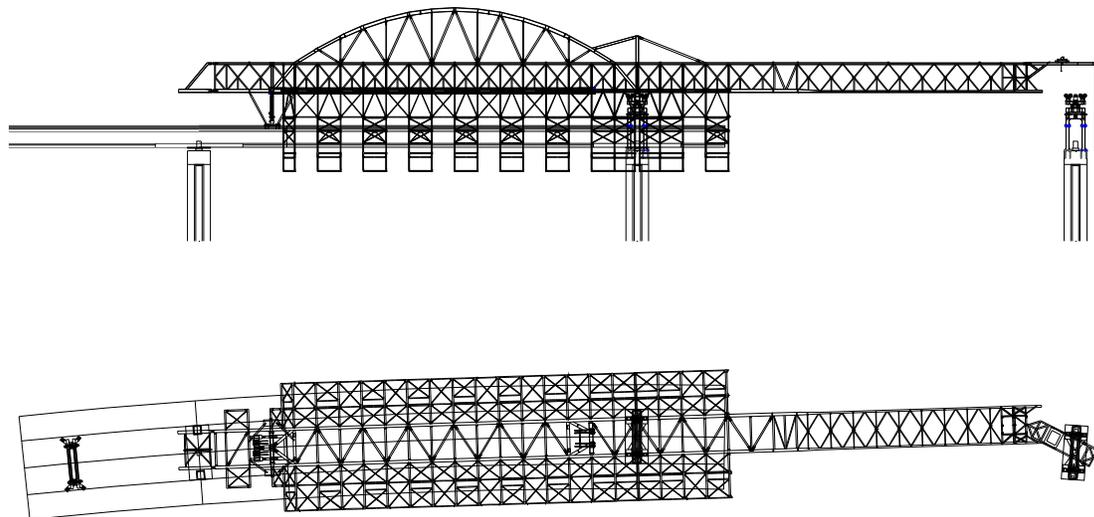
Elevation and plan view of single span construction movable scaffolding system
